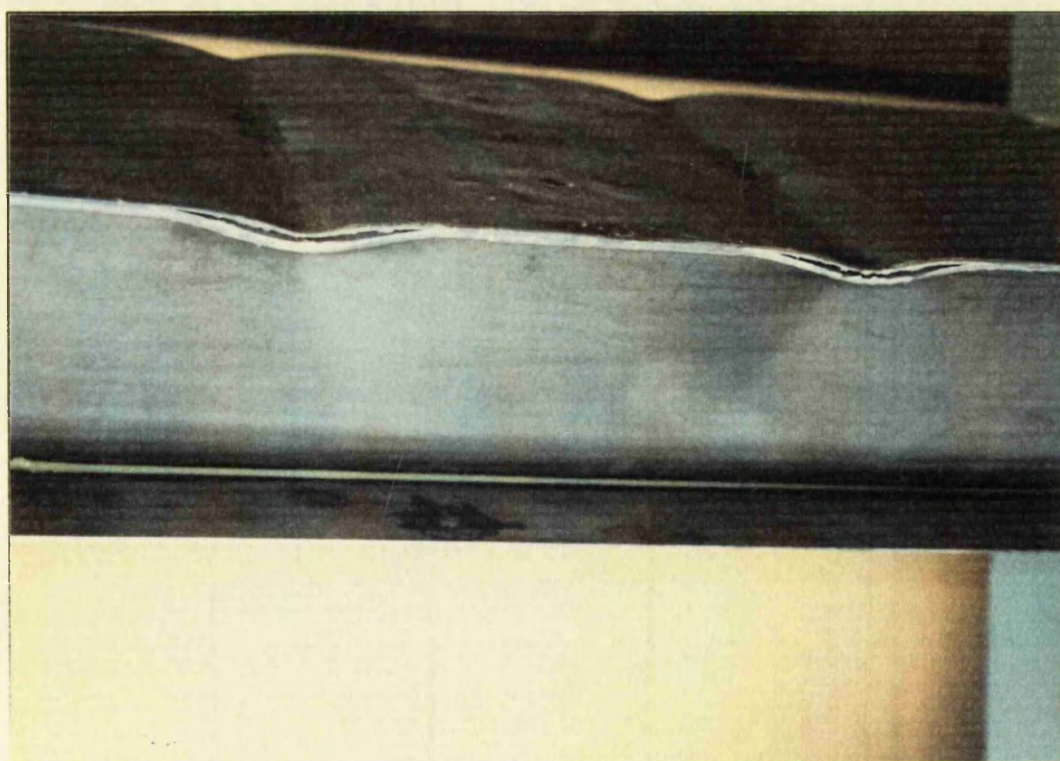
Model 3-4b: detail of the local deformation of the top plate
